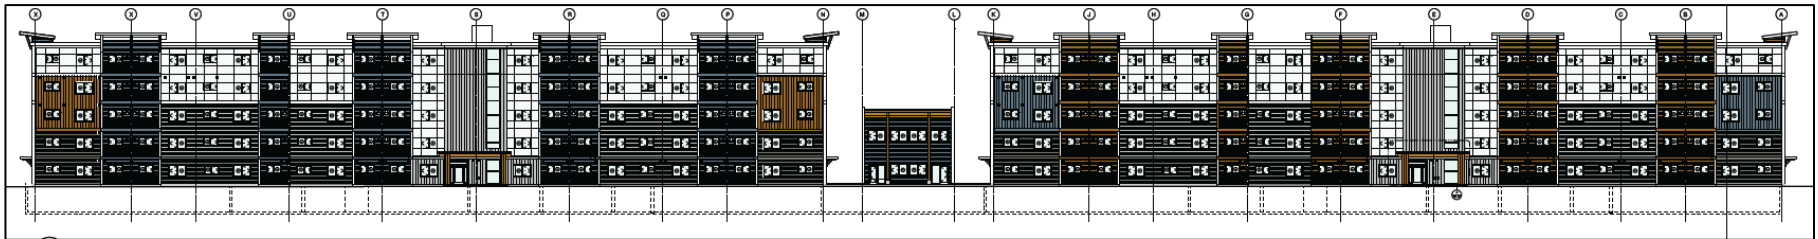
East Elevation of Proposed Buildings (Facing Parking Lot at Rear of Property)
